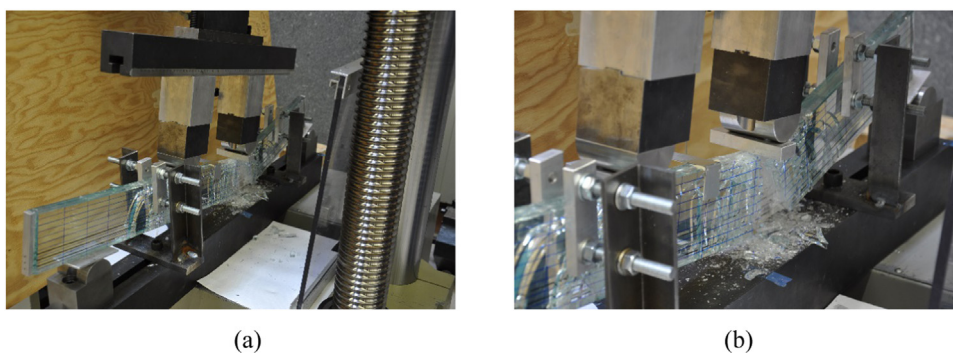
Failure configuration of the CFRP reinforced beams. (a) General view and (b) detail.
